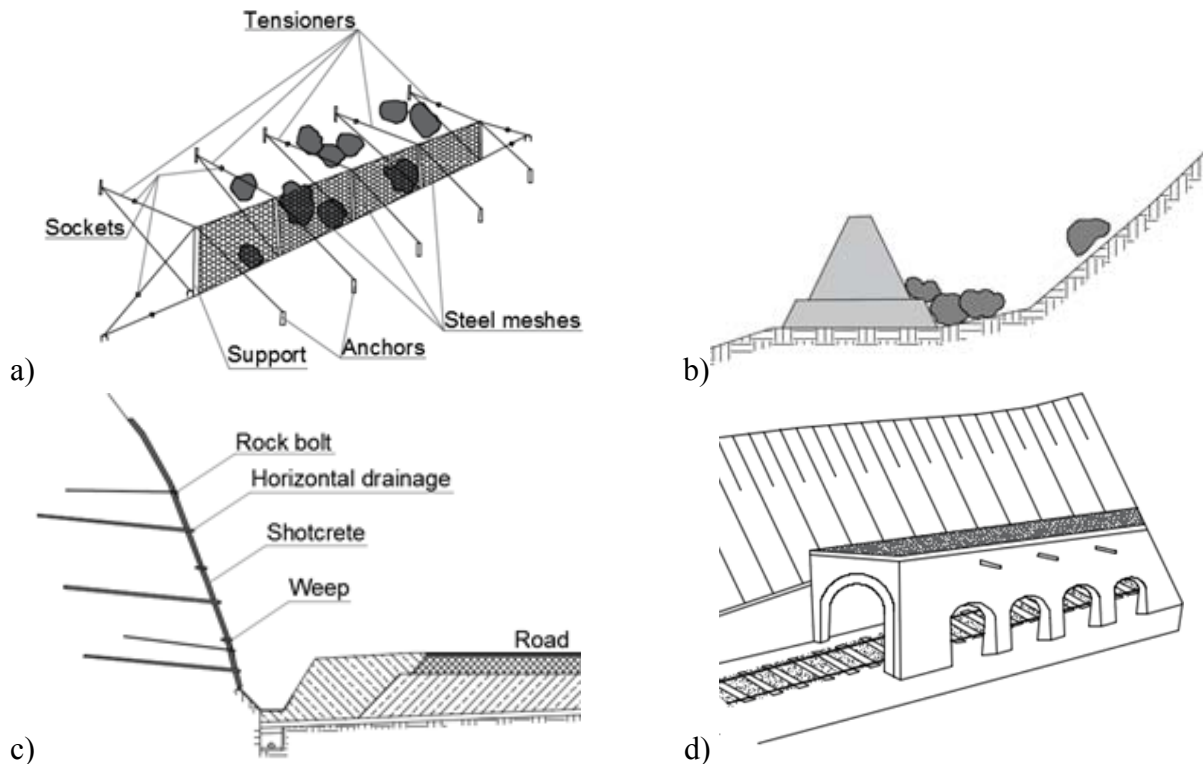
Rockfall protection facilities: a) Rockfall protection fence; b) Pocket wall; c) Installation of rock bolts and shotcrete; d) Rockfall protection gallery
